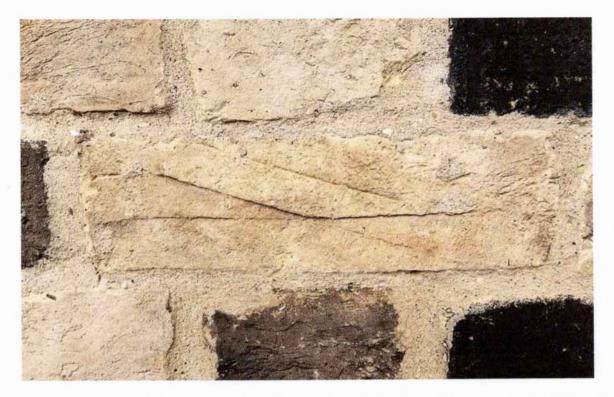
Restacked brick pressure mark on the stretcher of a brick found in the Garden Wall at Burleigh House, St Ives, Cambridgeshire. (Author)
